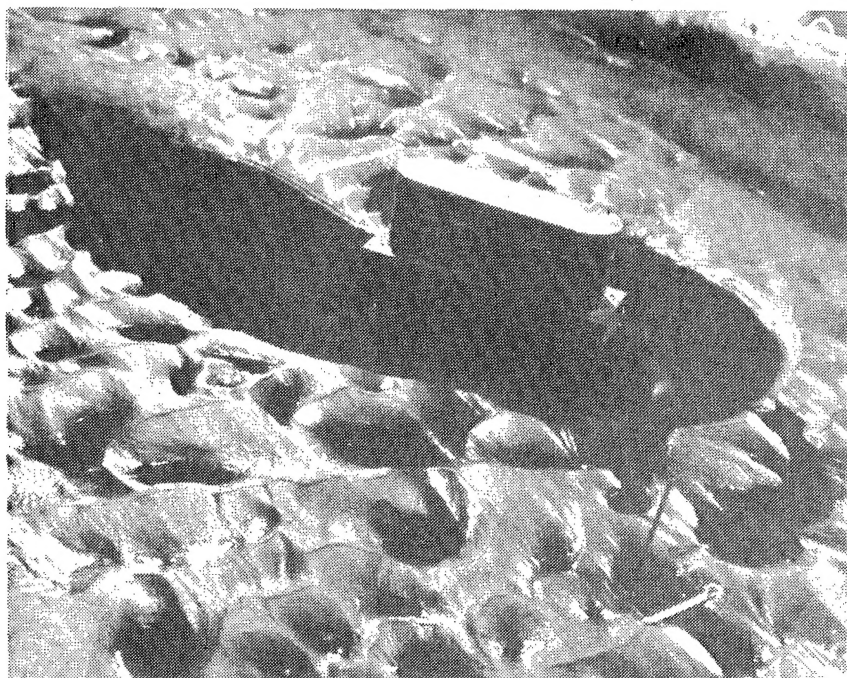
Run 11 looking from the left bank showing bed configuration at the end of run with pier at 25° angle to the flow.
